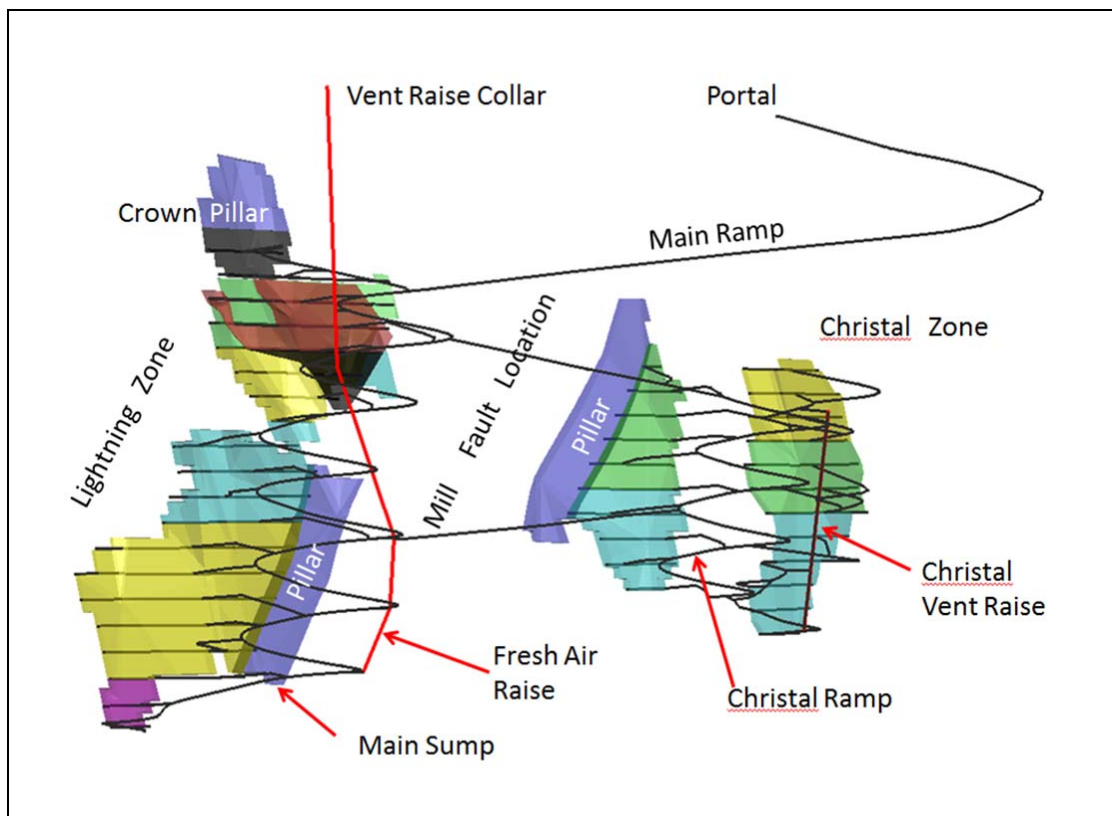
Flame & Moth 3D Underground Mine Model, Isometric View Looking Northwest (SRK, 2013)
